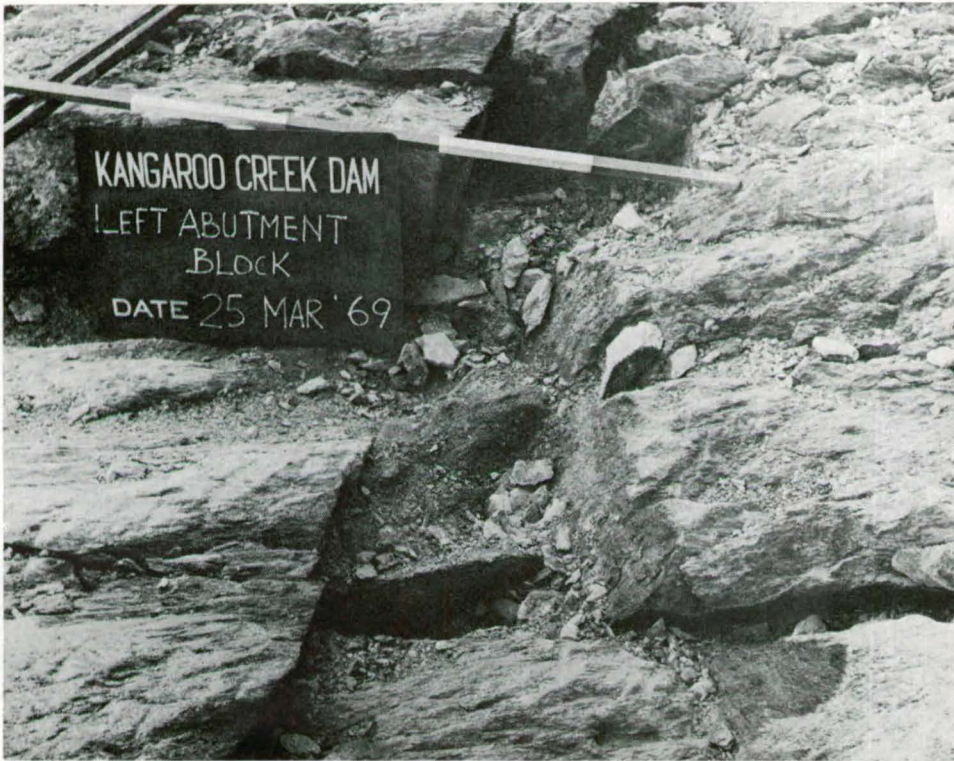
Gaping joints exposed in foundation for left abutment block.
